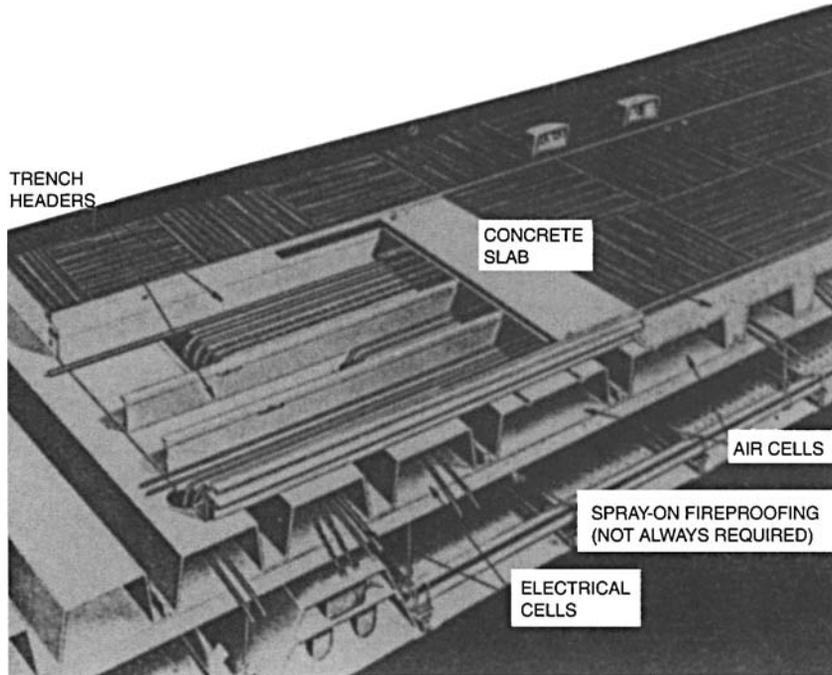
Cellular steel deck with trench header placed within the concrete slab to feed wiring to cells.
